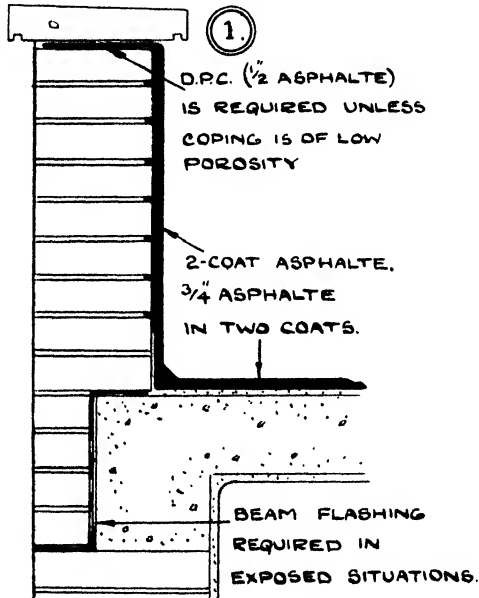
PARAPET WITH BRICK EXTERNAL FACE AND ASPHALTE-COVERED INTERNAL FACE
